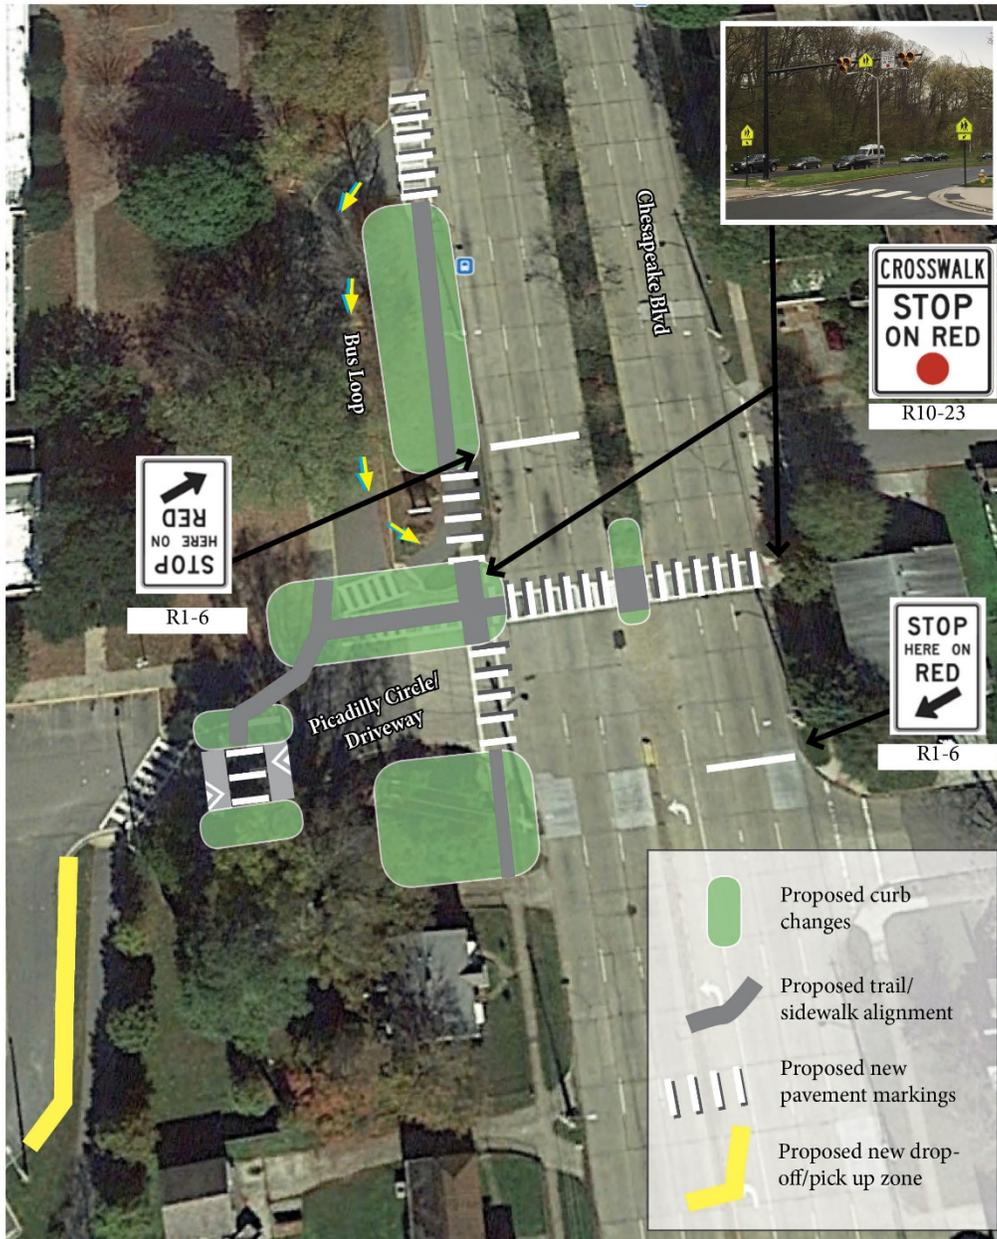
Concept for Recommended Improvements on Campus and at the Picadilly Circle/Chesapeake Road intersection.
